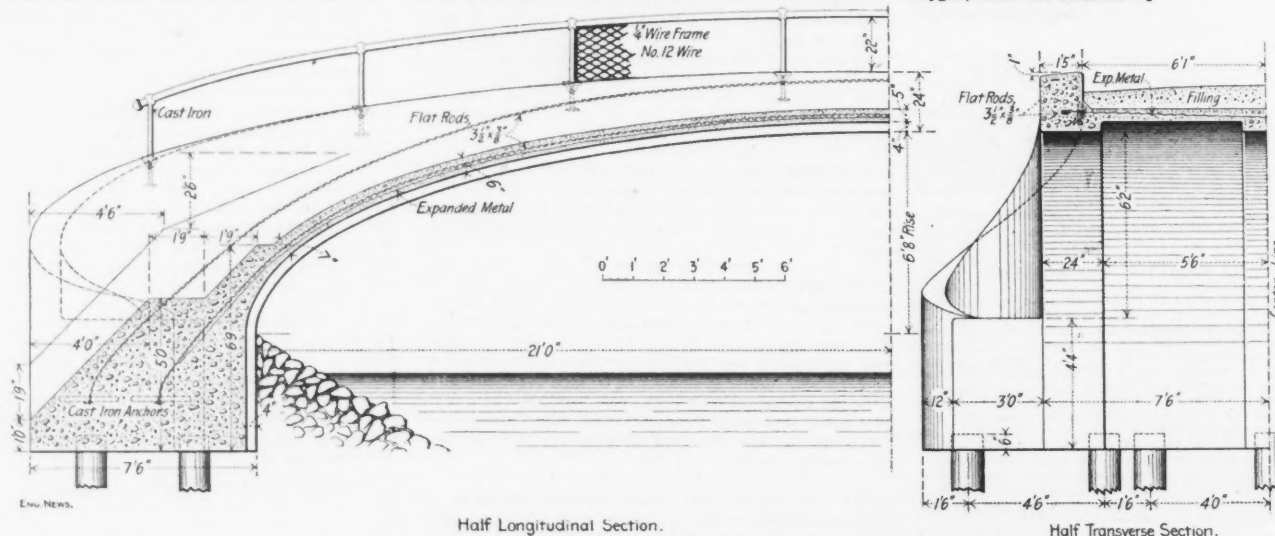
DETAILS OF CONCRETE ARCH BRIDGE AT OCONOMOWOC, WIS.
